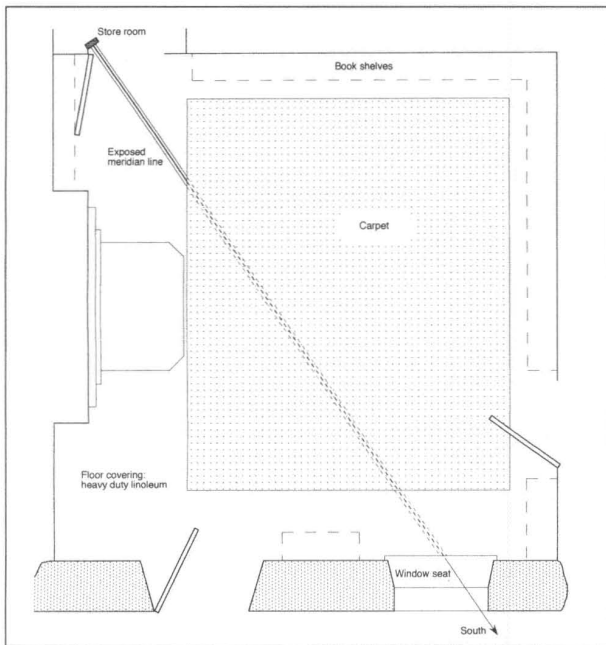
Plan of the Standfast Room. From this plan the meridian line is at an angle of 55.3° to the wall.
